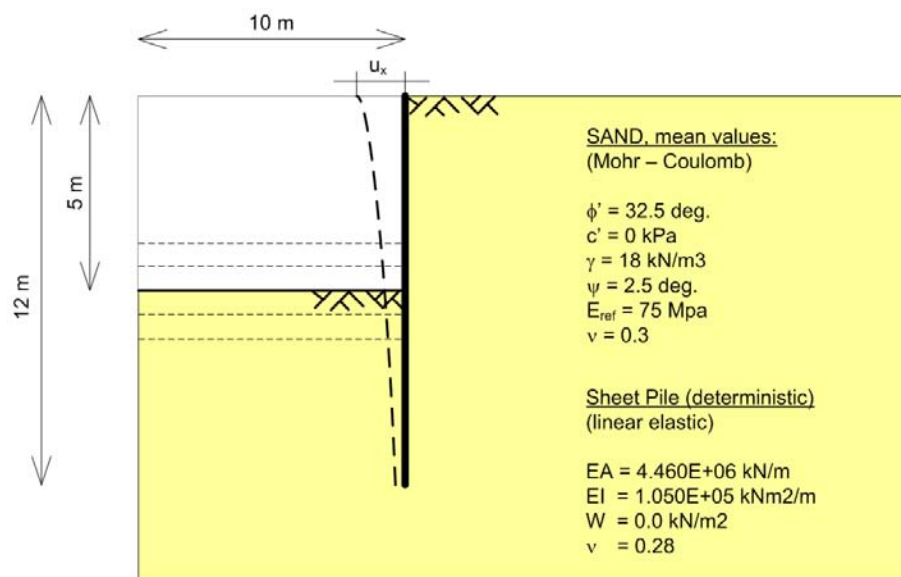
Calculation Example: Sheet Pile Wall (Without Anchors)
